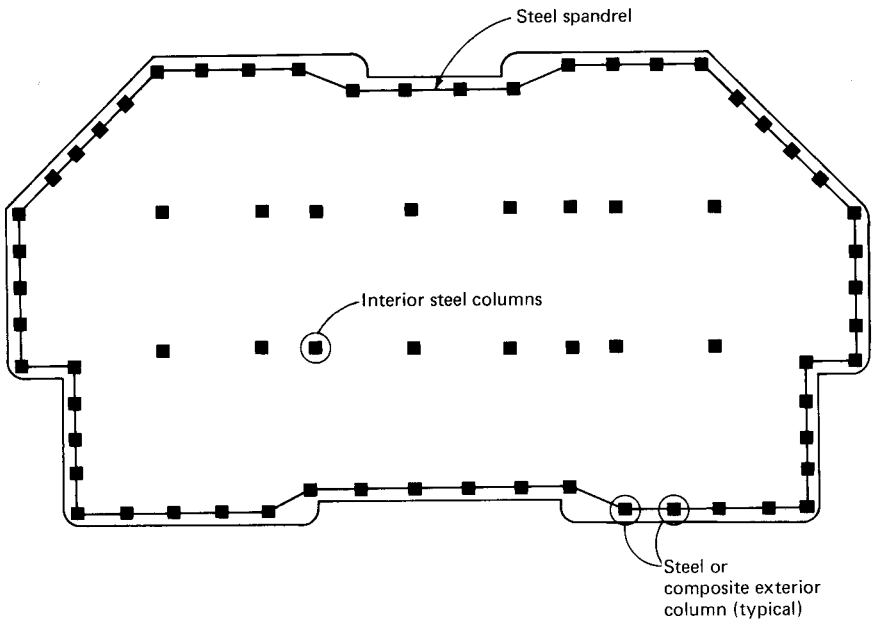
Framed tube with 10- and 15-ft (3- and 4.57-m) column spacing.
